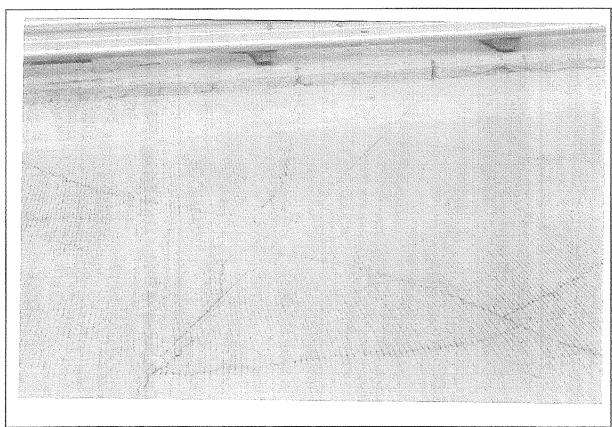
Showing Cracked Bridge Deck. Spring 1995 Inspection
